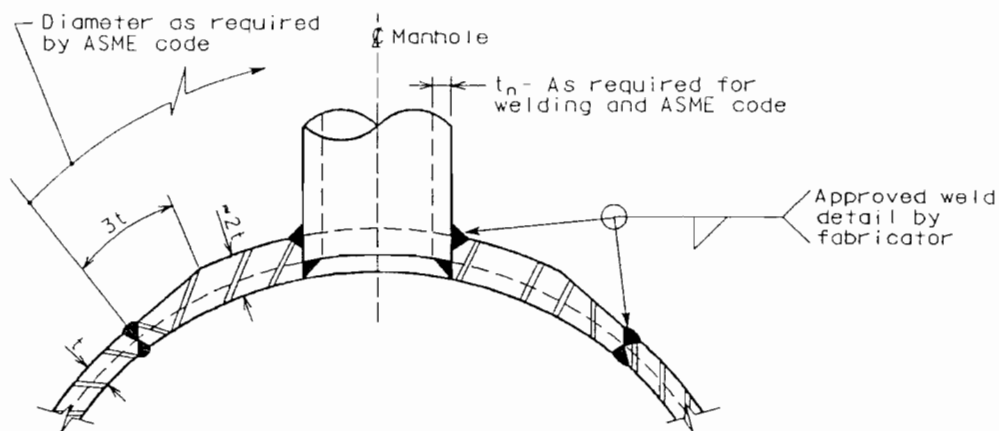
Typical 24-Inch Access Manhole for Buried Penstocks
